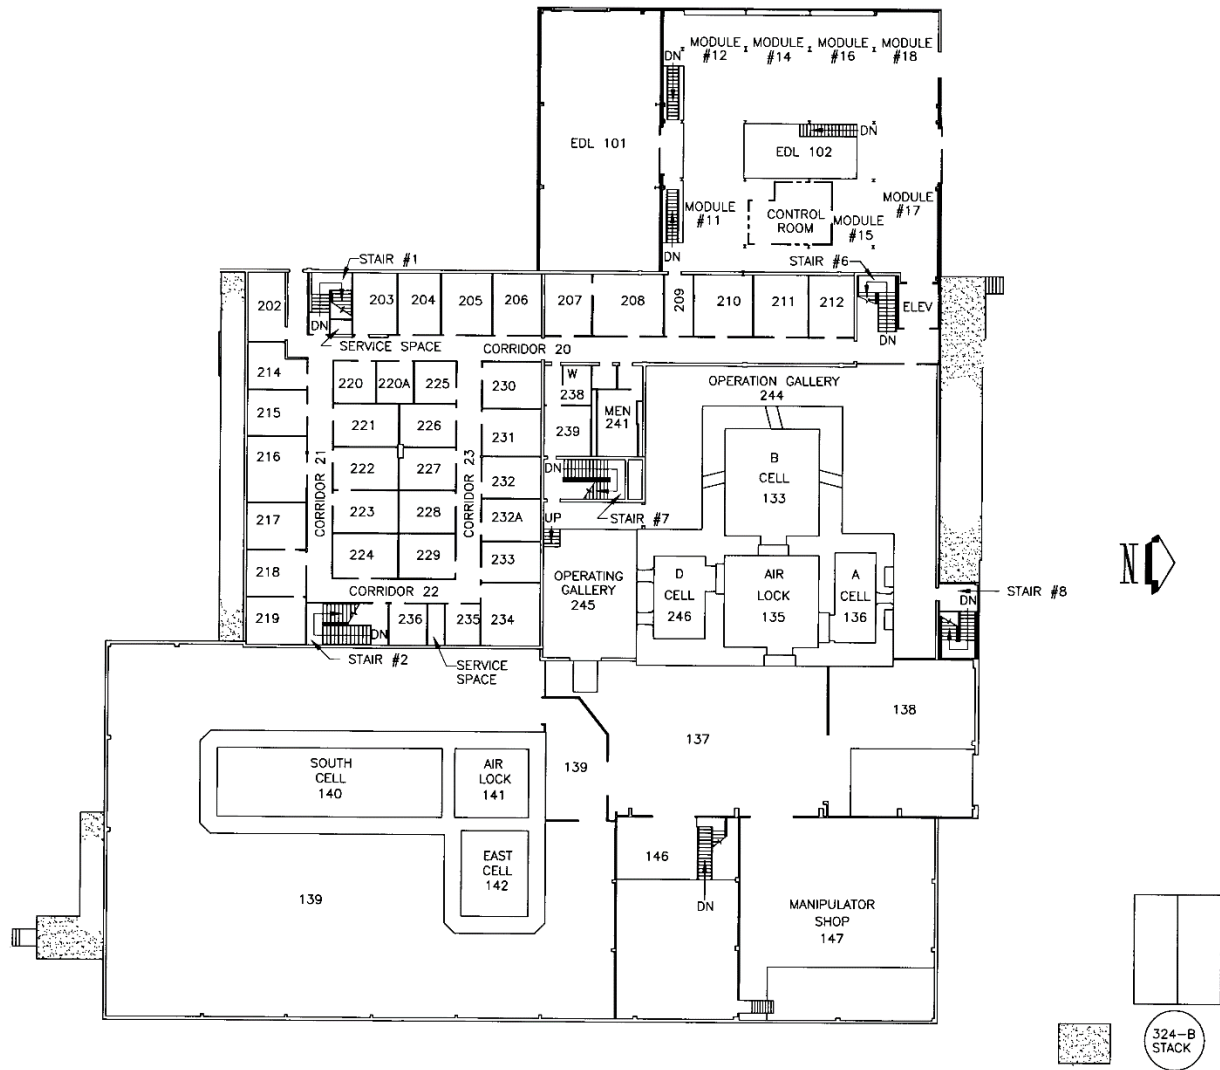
324 Building Simplified Floor Plan (Second Floor)
